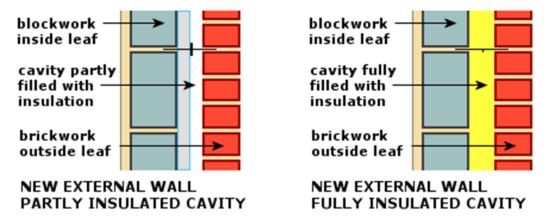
The new external wall with A party insulated cavity and B with fully insulated.
